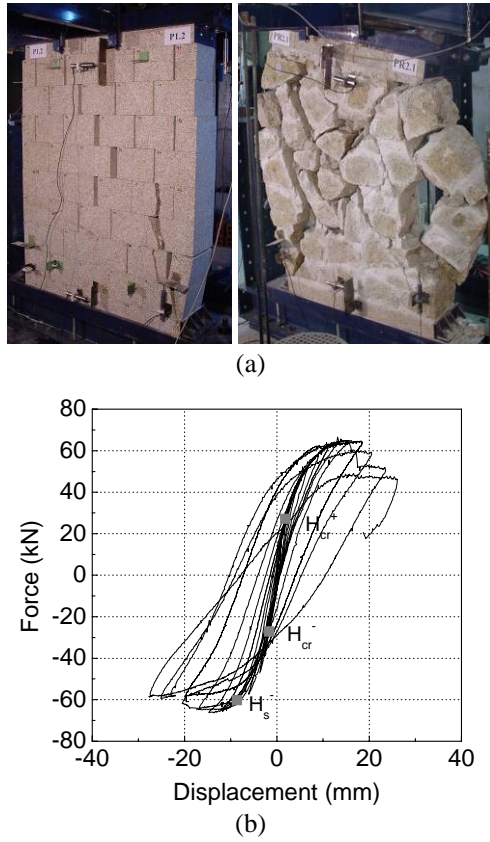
Behavior of stone masonry walls with different bond: (a) failure modes and (b) selected force-displacement diagram.
